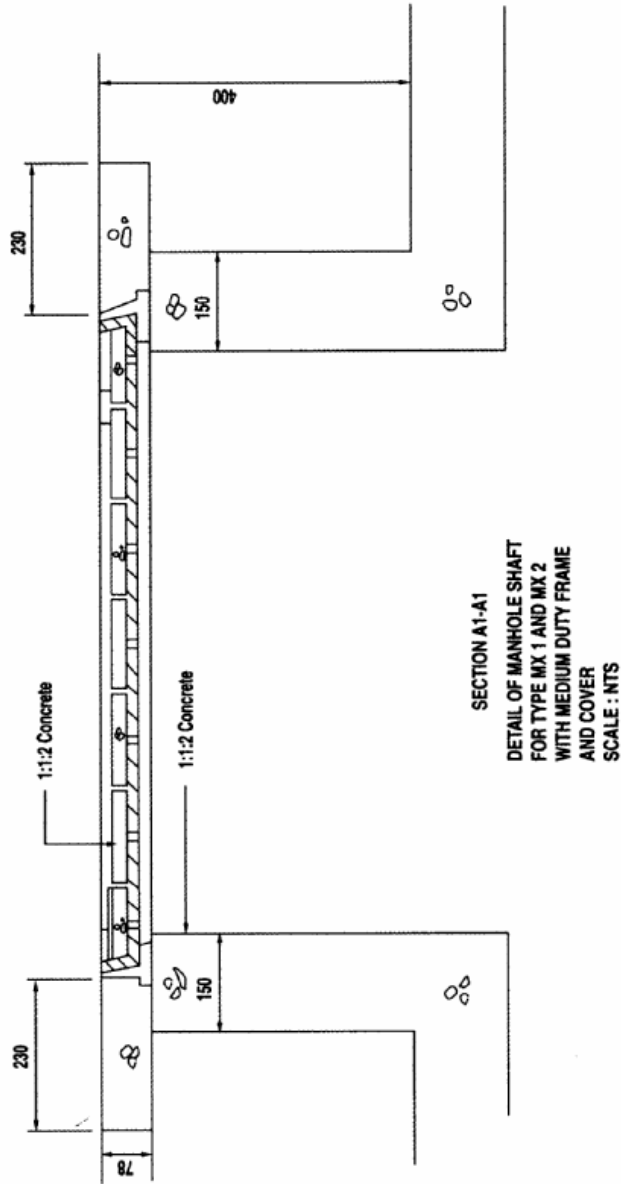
Manhole Drawings – Type MX1 & MX2
